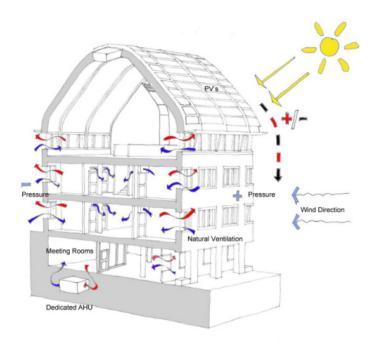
Natural Ventilation Schematic – Kroon Hall
